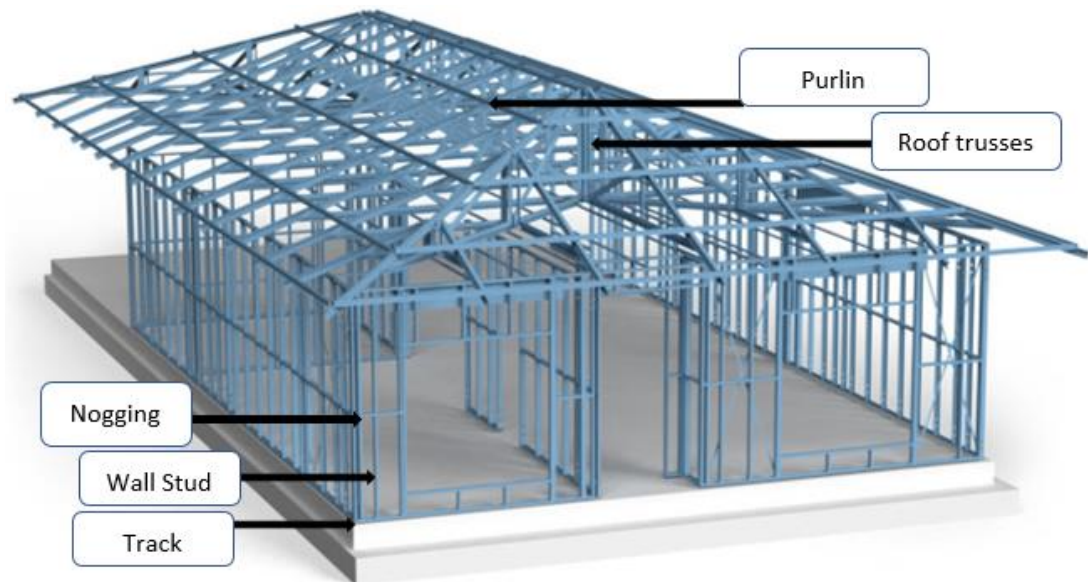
Cold-formed Steel Structure (“Supaloc Steel Building System,” n.d.)
